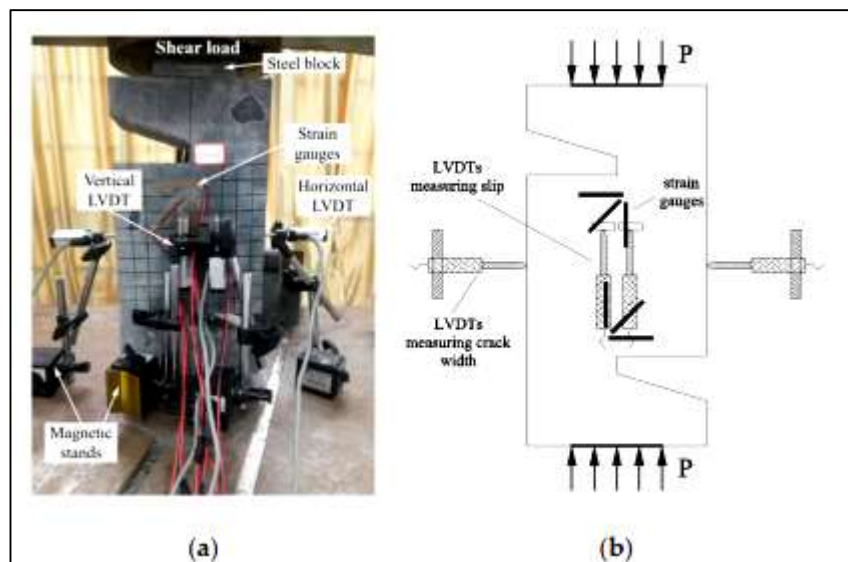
Direct Shear Test of Concrete (a) Test set up (b) Plan of the Transducers (Chuanxi Li, 2019)
